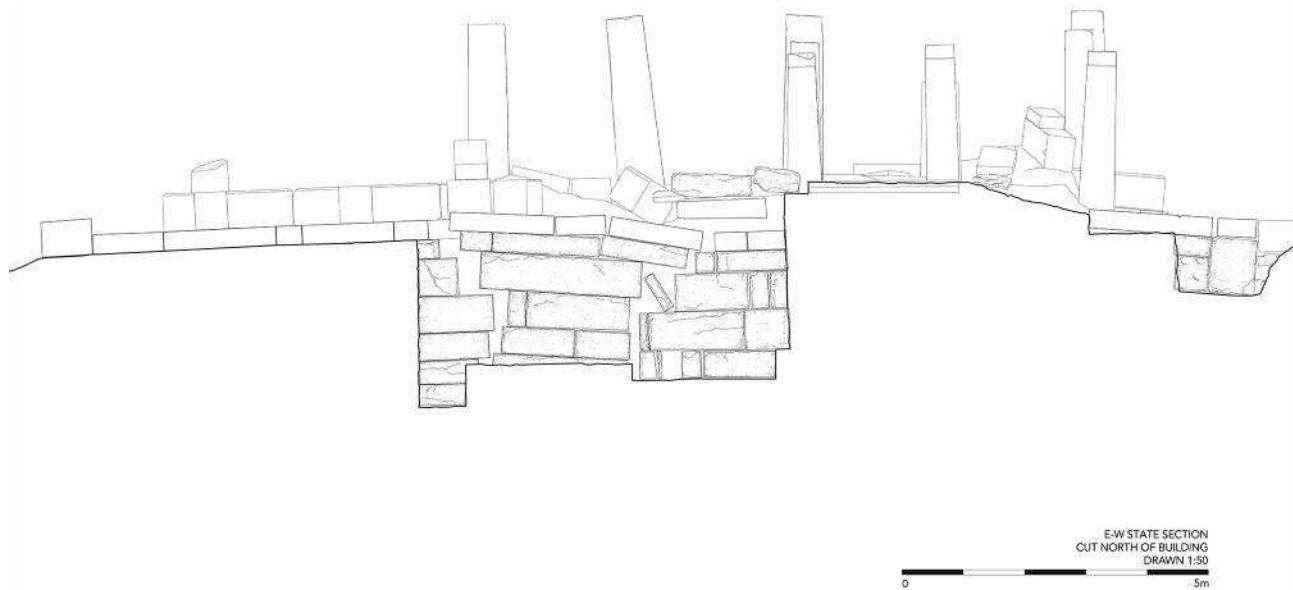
State section (E-W) of HF after excavation, looking S (BULP).
